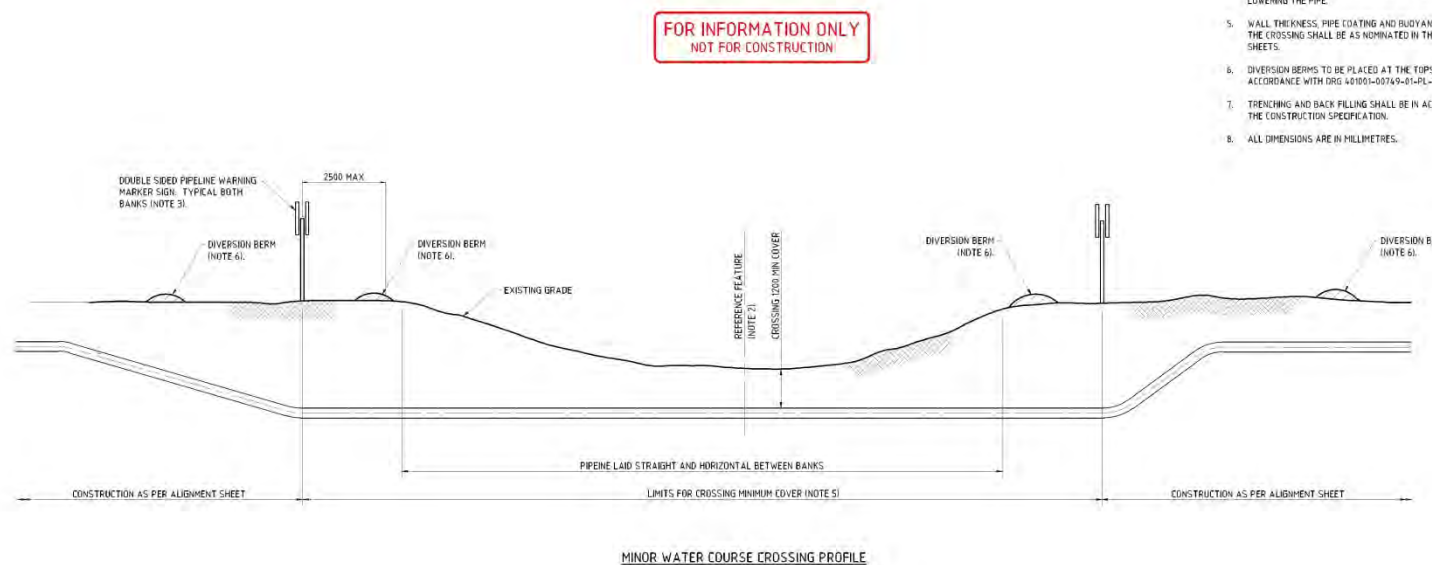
Profile of minor watercourse subject to open cut crossing for installation of pipe
